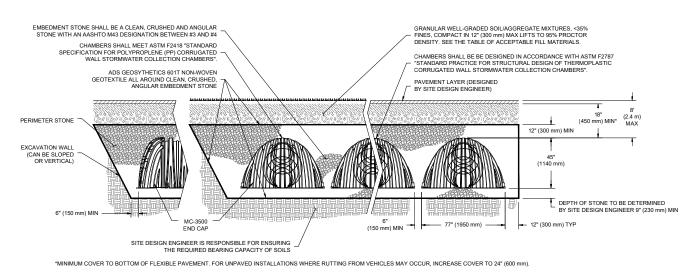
A - MC-3500 Structural Cross Section Detail (Not to Scale)
